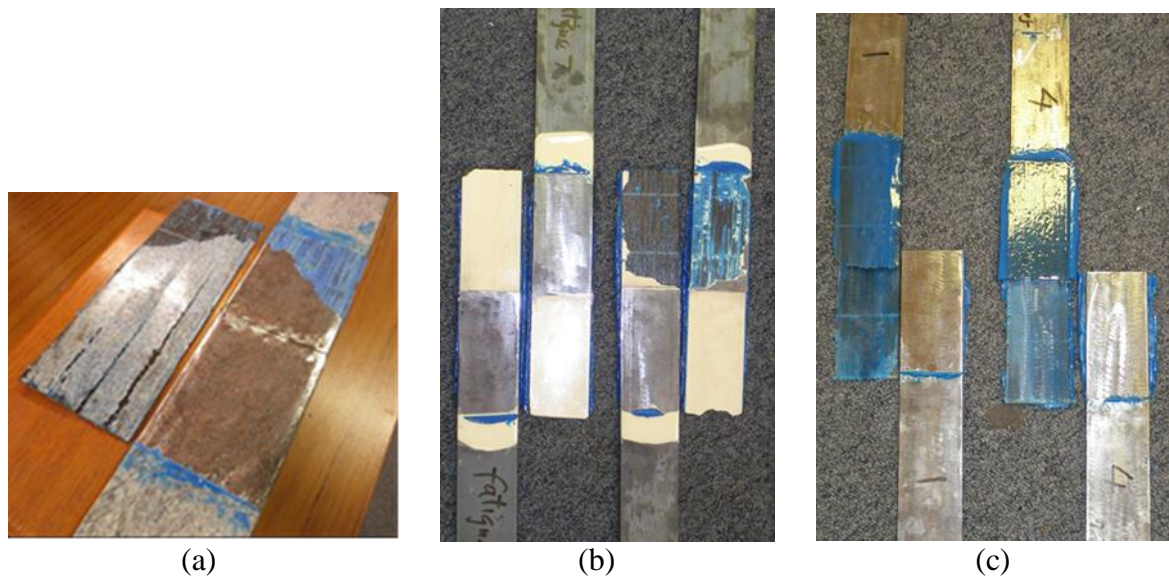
Debonding failure (a) Specimen B1 (b) Double strap joints with the primer resin (c) Double strap joints without the primer resin
